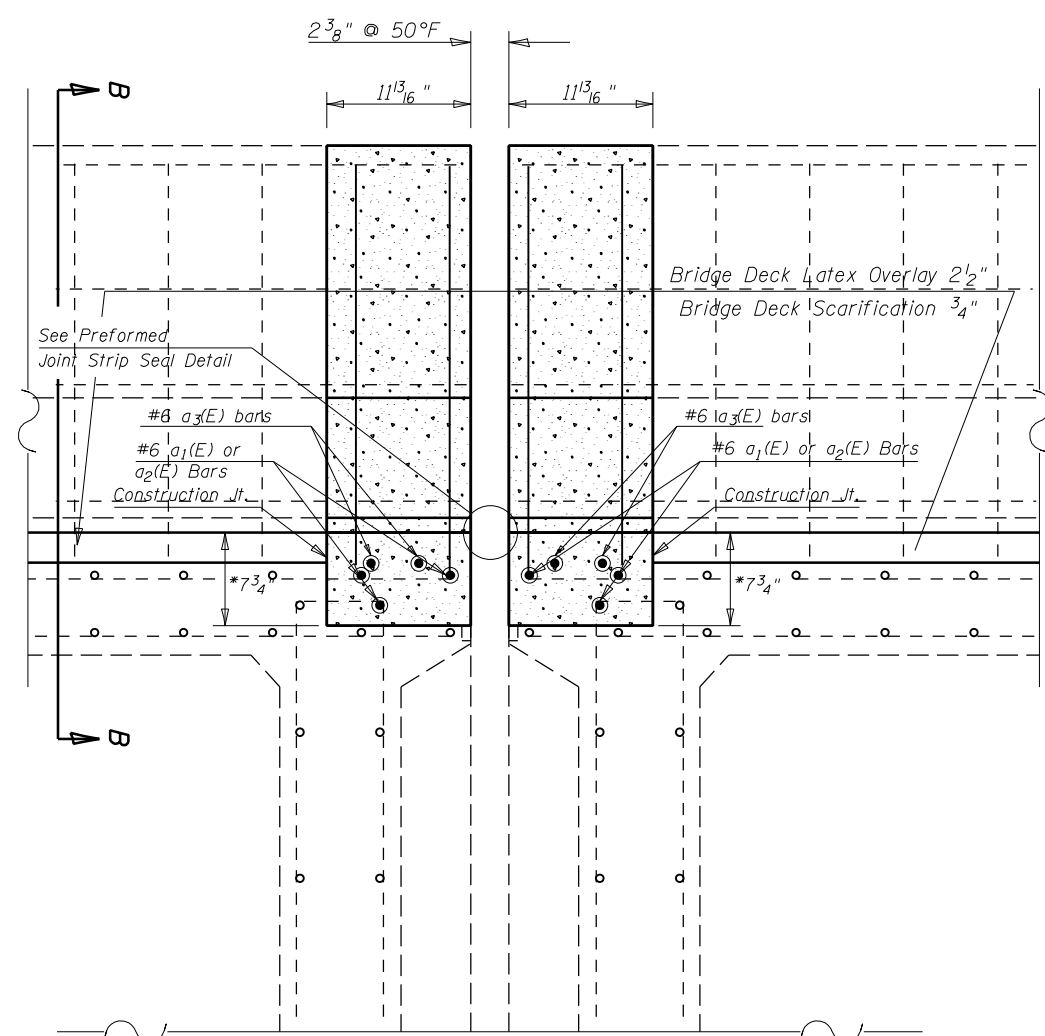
DETAIL OF STRUCTURAL CONCRETE REMOVAL PIER 1
